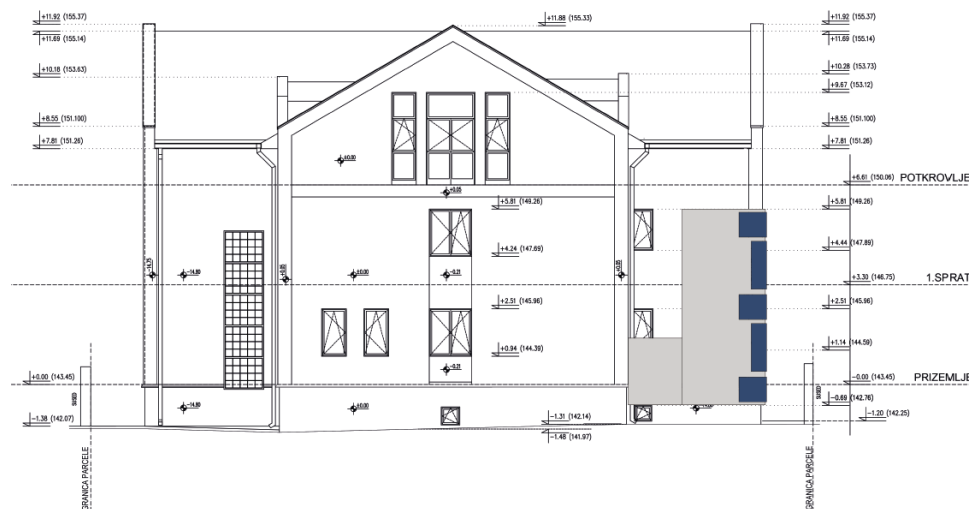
Appearance of the southern facade of the office building with the installed barrier
